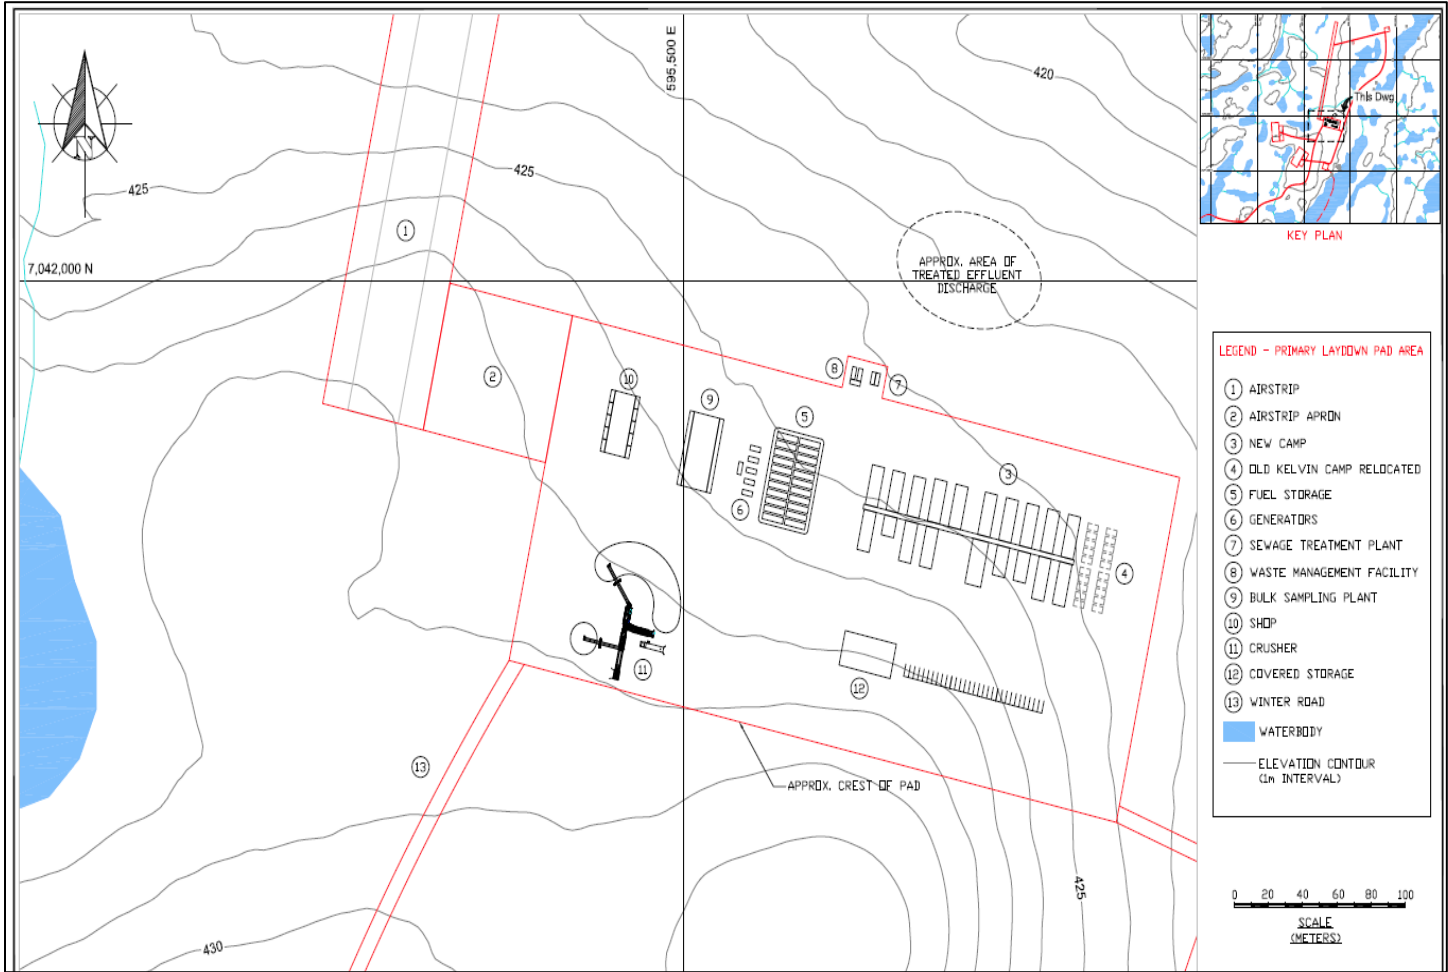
Kelvin Camp Expansion Infrastructure and Site Layout (Approved)
